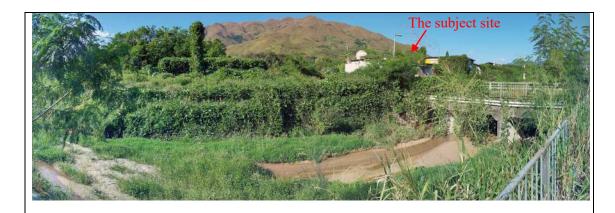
View at the about 13m wide trapezoidal shape branch channel of the Kam Tin Main Stormwater Channel at about 85m away from the subject site
